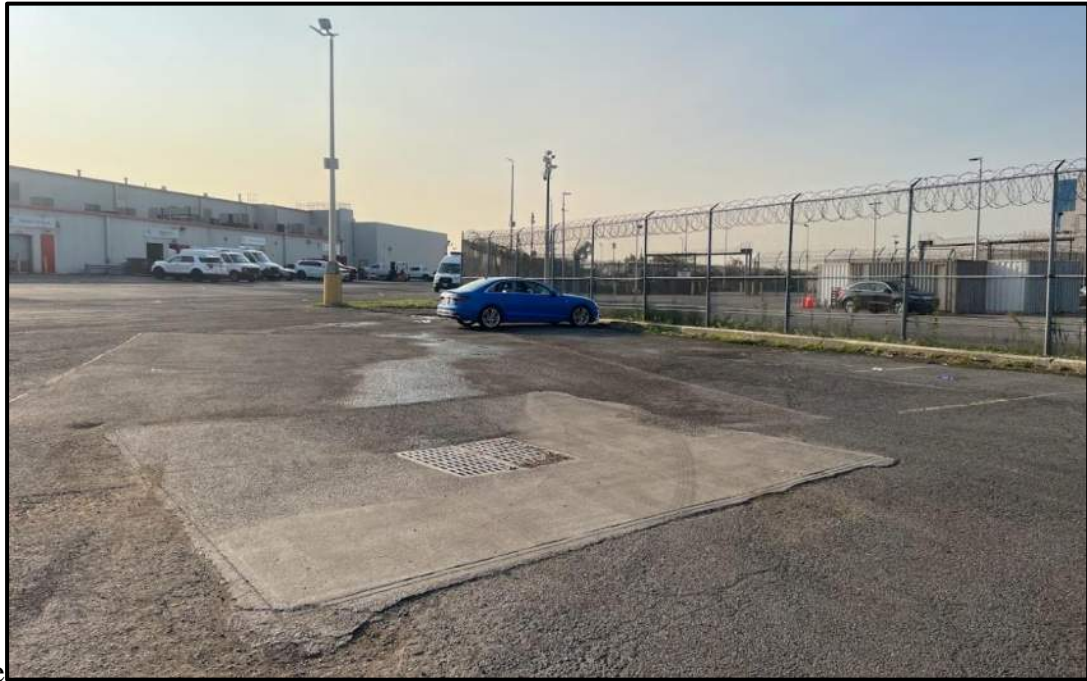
Facing southeast in the southern portion of Site; potholes and cracking noted in the asphalt surrounding catch basin (repaired in January 2022).
